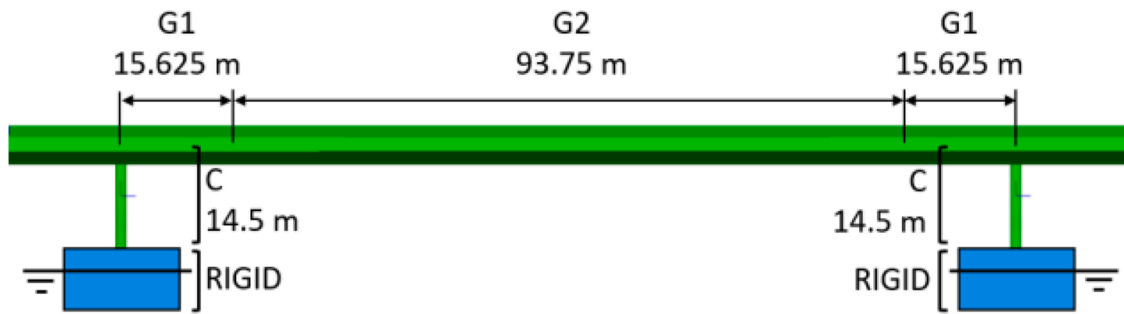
Composite girder in the generic bridge – G1,G2 and C denote different cross sections.
